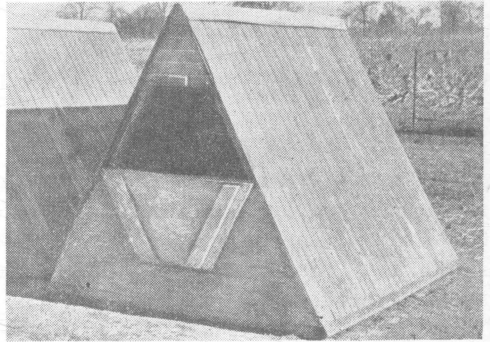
Rear view of an A-type farrowing house. Has rear door for ventilation and attention to litter. The heavy sills keep the siding off the ground. Plan No. 02603.
